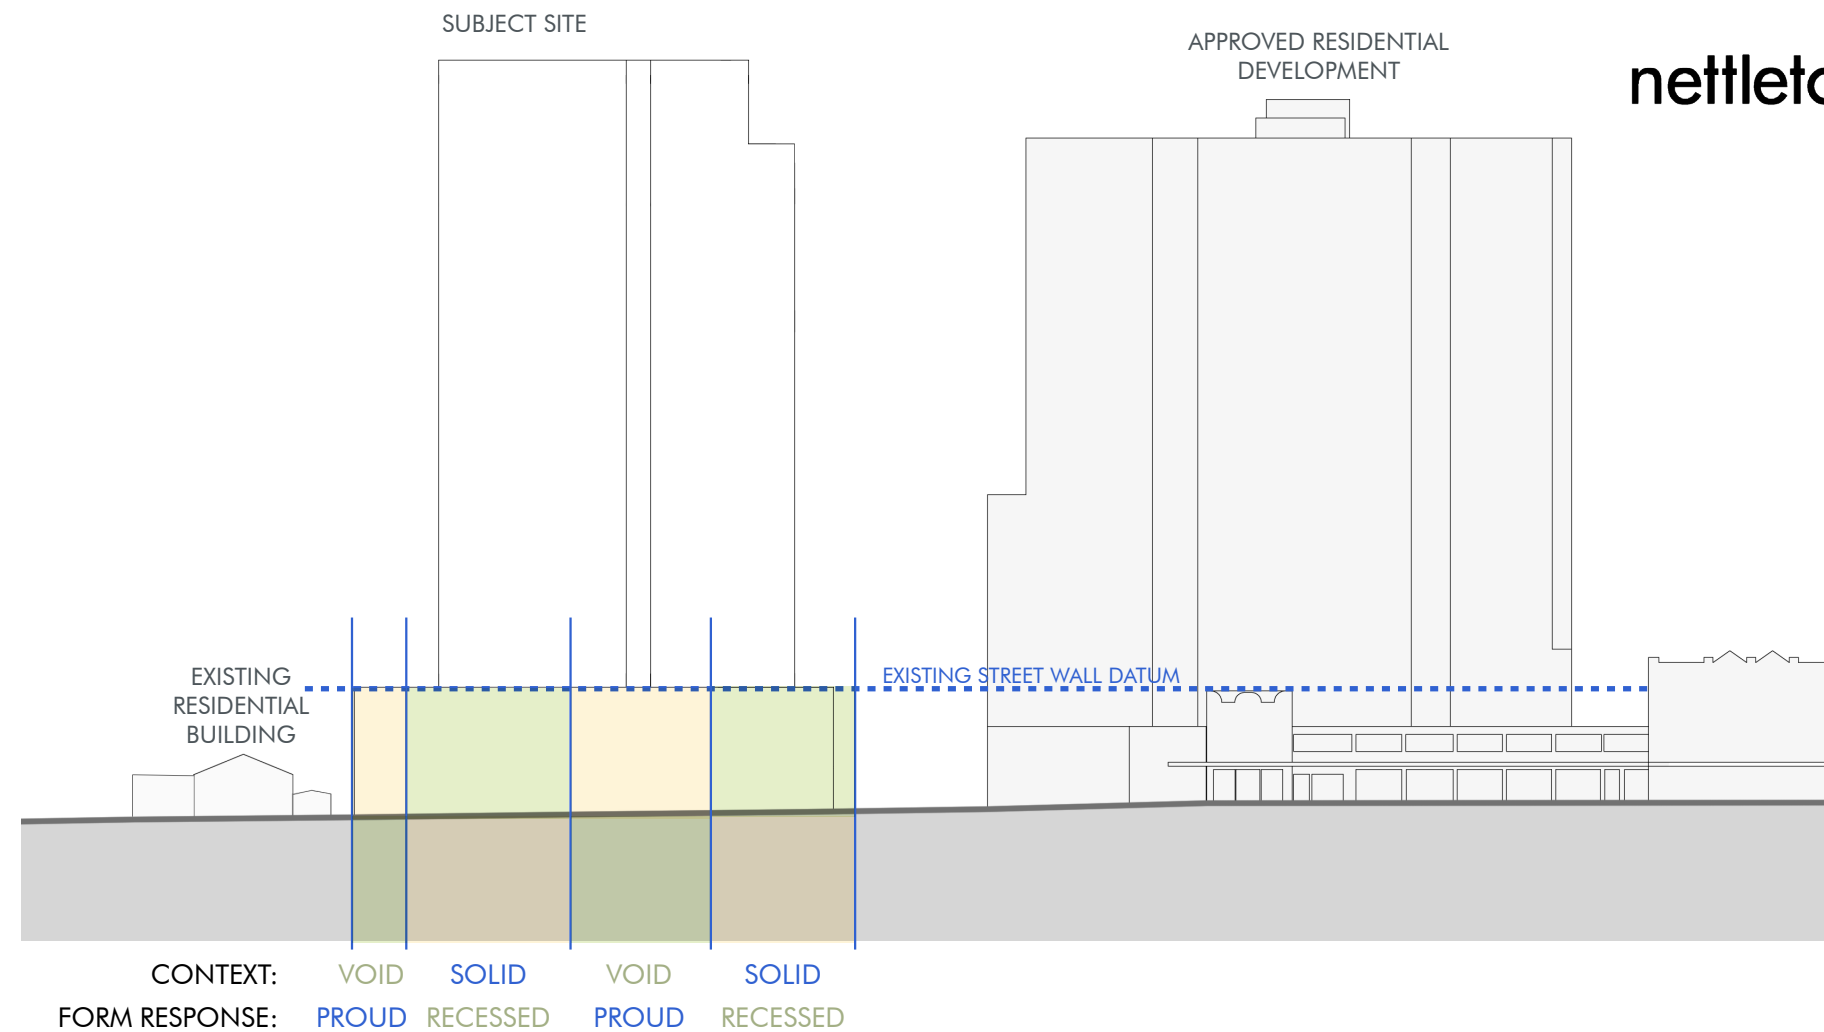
Site Elevation - Response to Existing Street Rhythm
